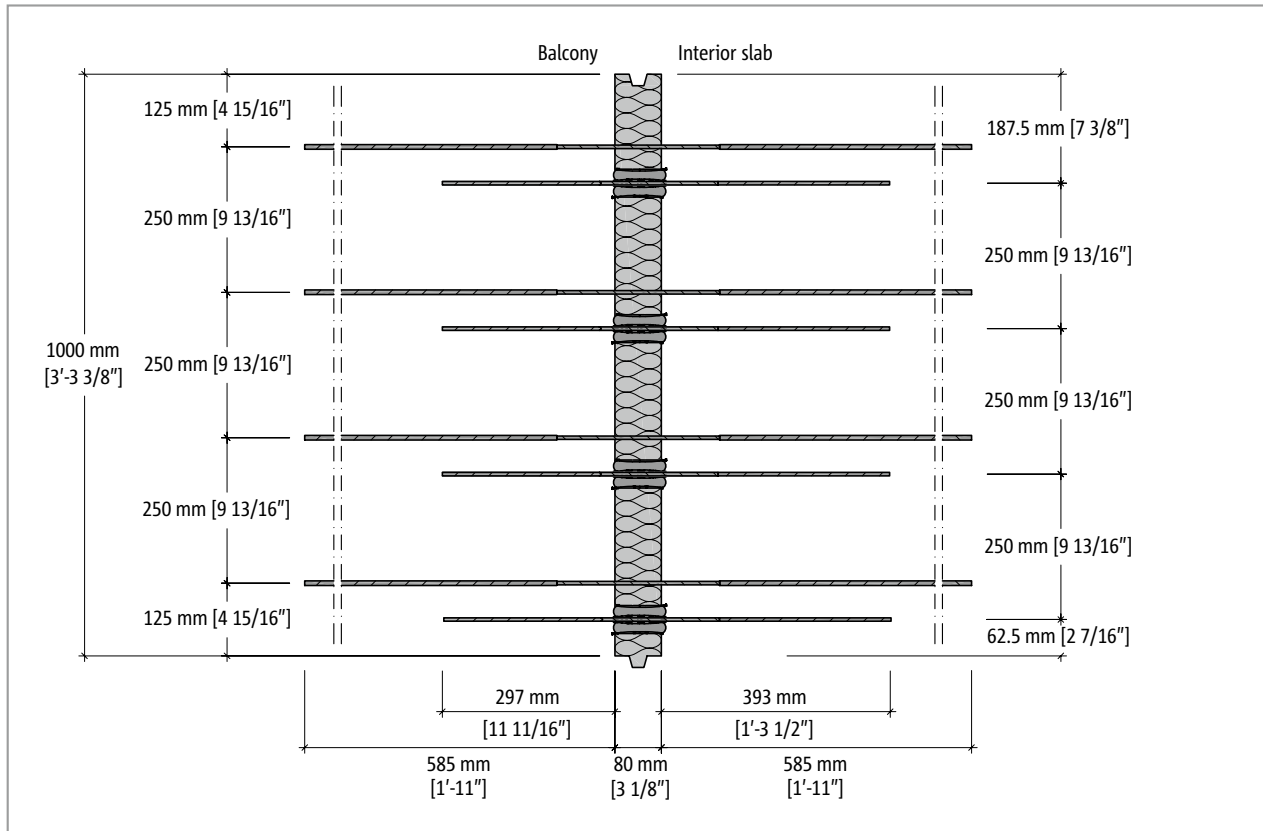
Schöck Isokorb® T Type CK-M1-V1: Top view of the product
